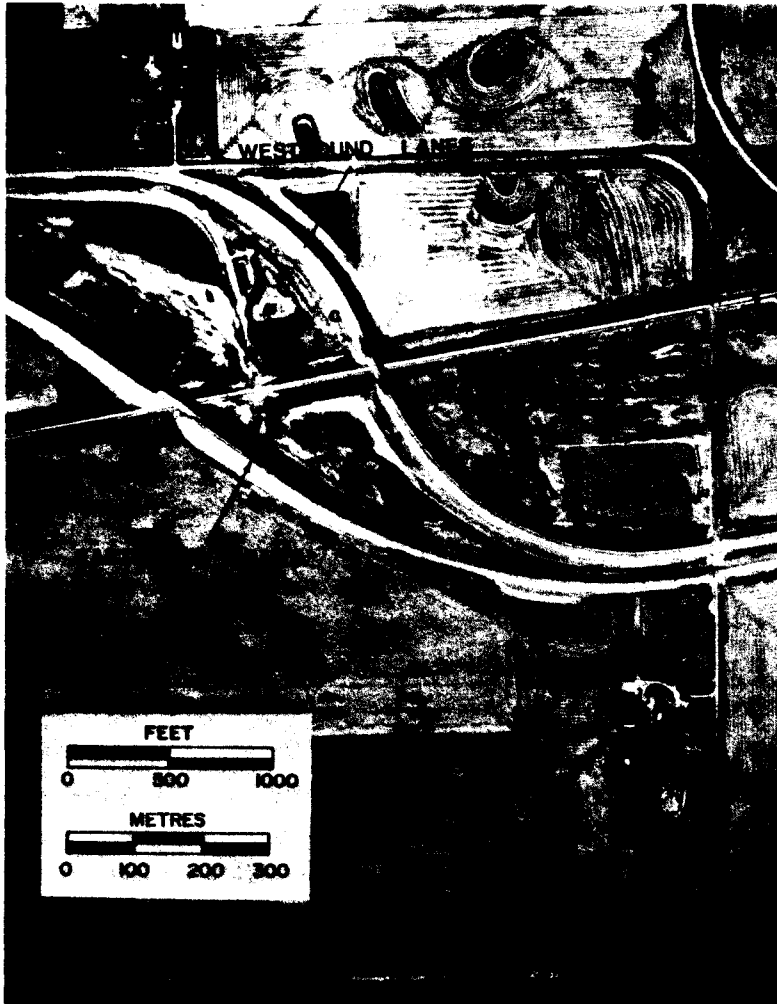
OVERPASS LAYOUT AT BELLE PLAINE,
